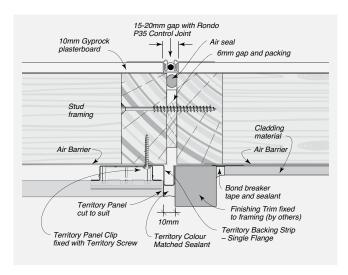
Typical Junction Detail with Fibre Cement Cladding System
